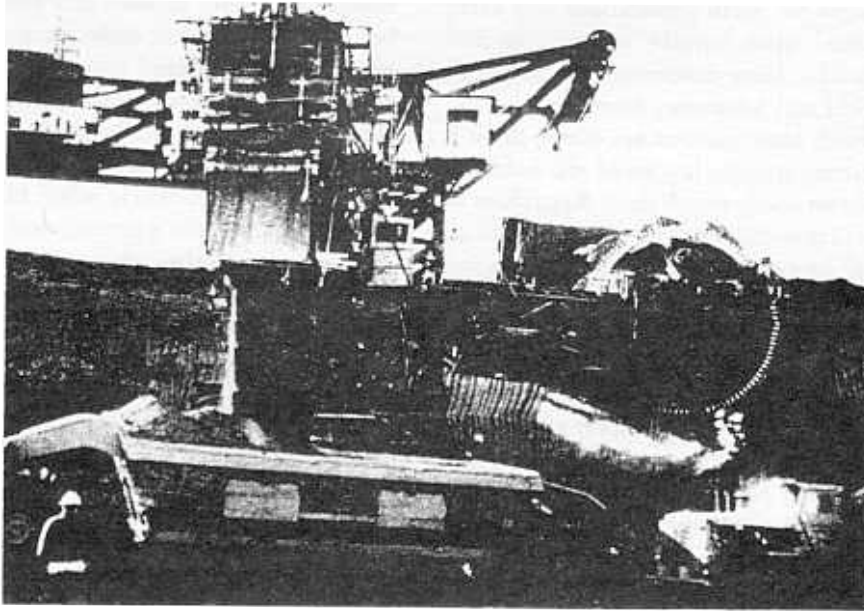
Wheel excavator used to excavate impervious soils, San Luis Dam, California.
